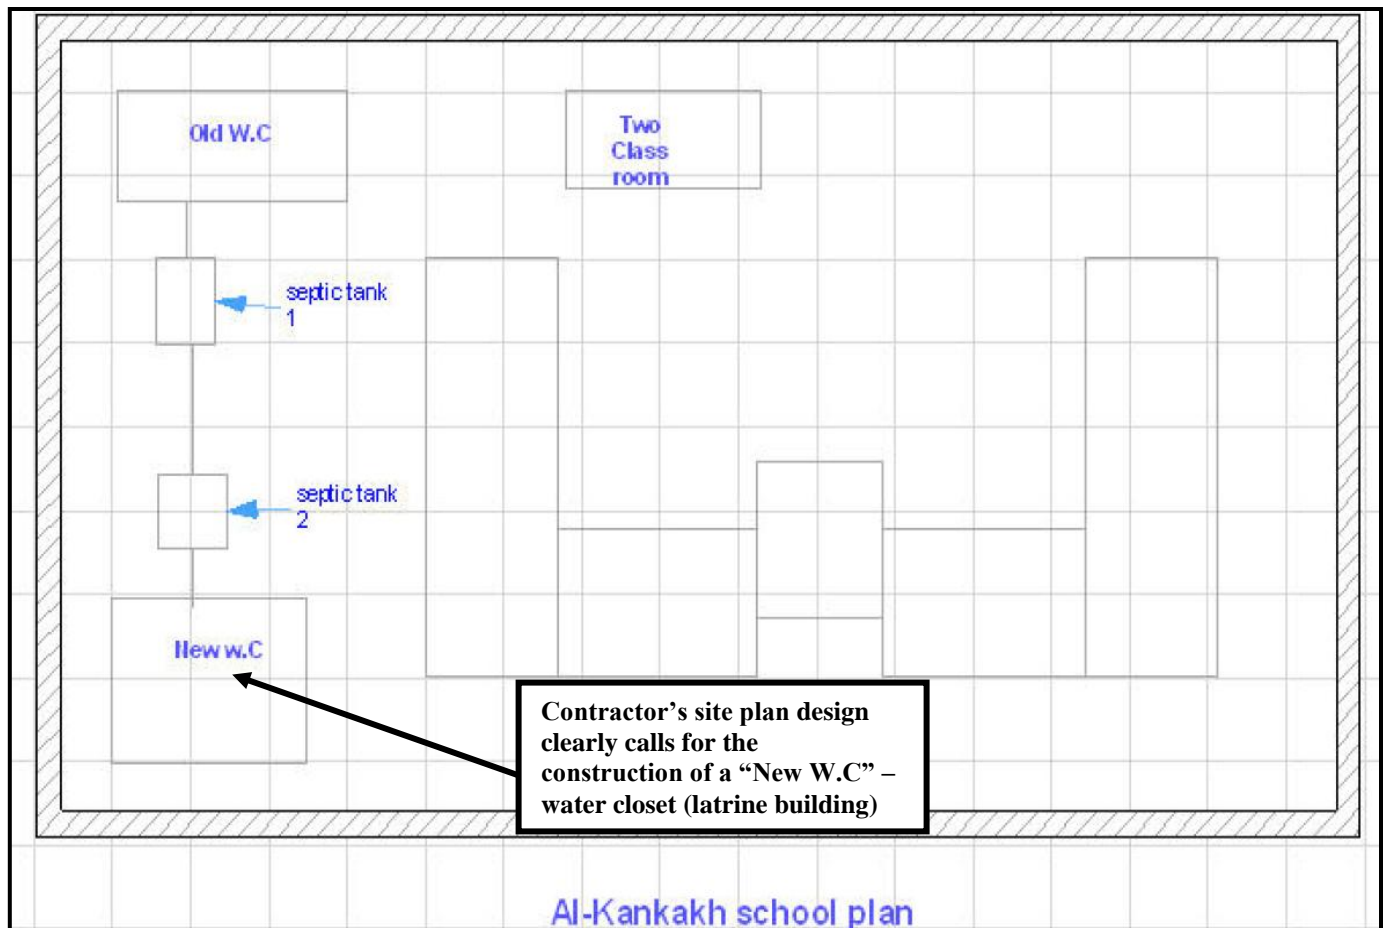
Contractor's site plan submittal clearly showing the construction of a new water closet (latrine building) (Courtesy of GRC)
